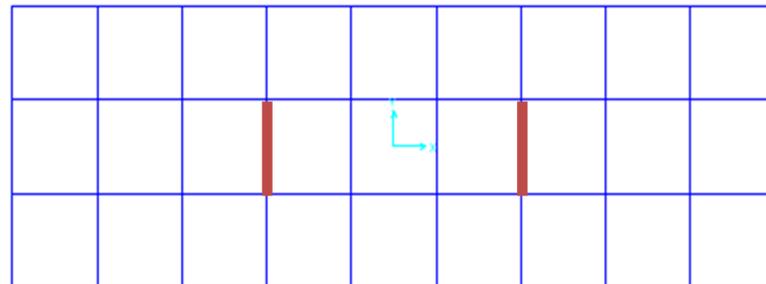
Shear wall curtailed at various storey levels (from 20 up to 8 storey height) and ultimately, building with no shear wall
